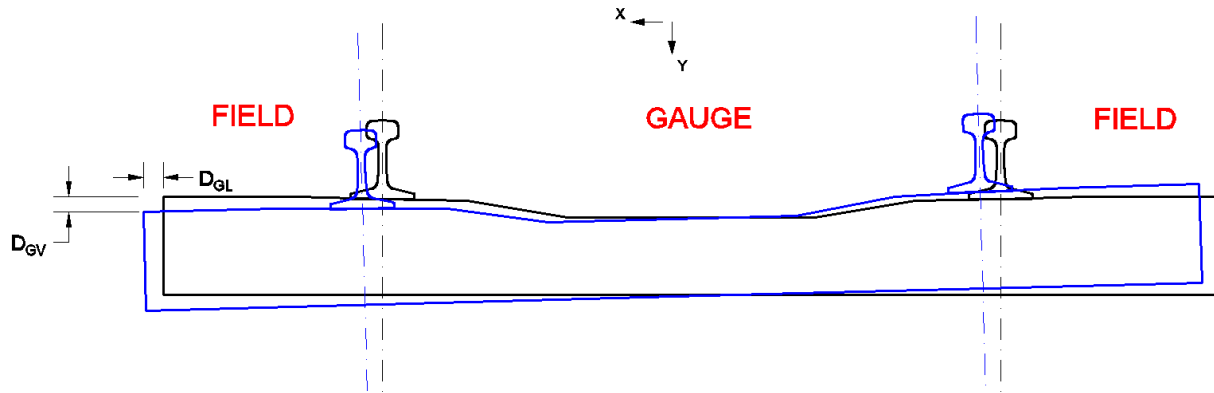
Undeformed/deformed Shape of a Concrete Crosstie
